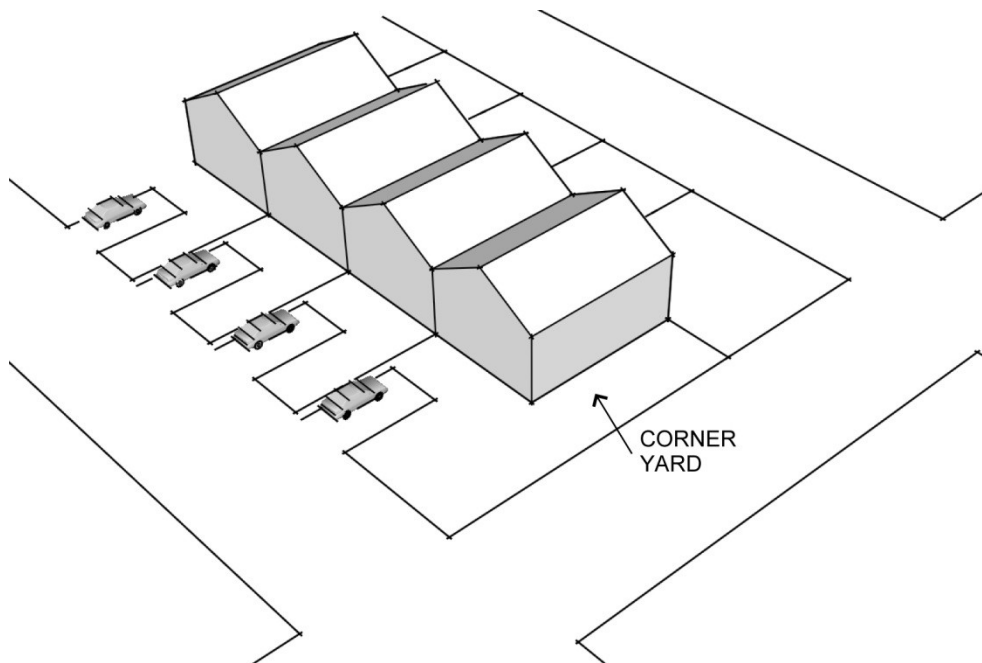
Illustration of Splitting a Lot Containing Attached Dwellings
